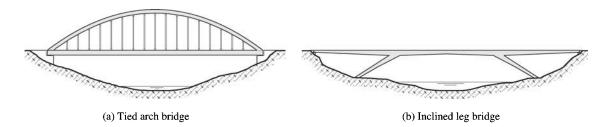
Tied arch bridge and inclined leg bridge.
